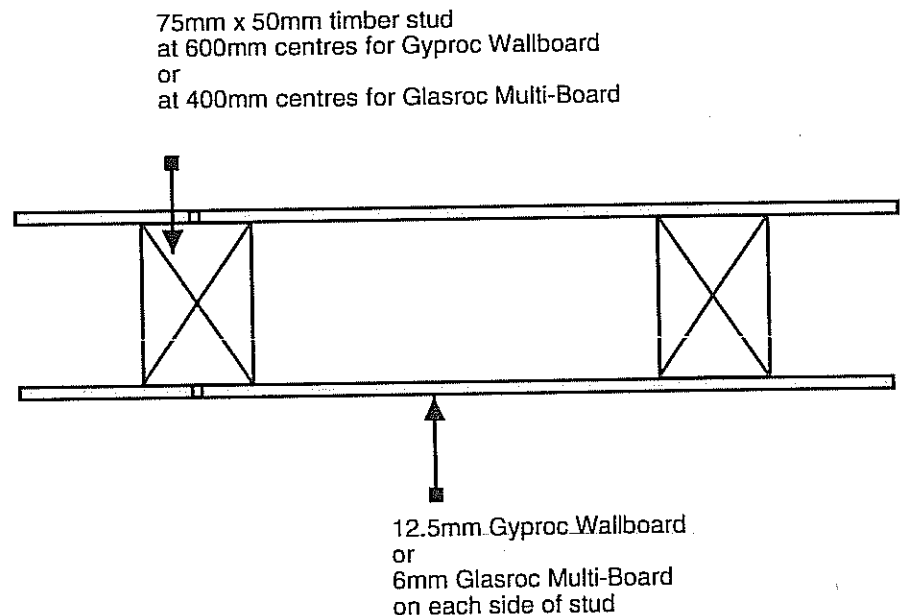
Use of Gyproc Wallboard or Glasroc Multi-Board to provide a partition with 30 minutes fire resistance
